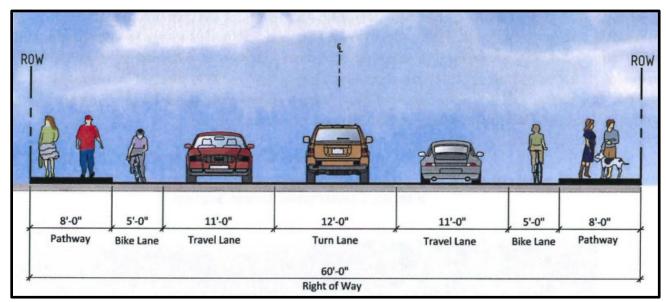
2012 Refined Streetscape Design Plan State Route 1 recommended streetscape cross section.
